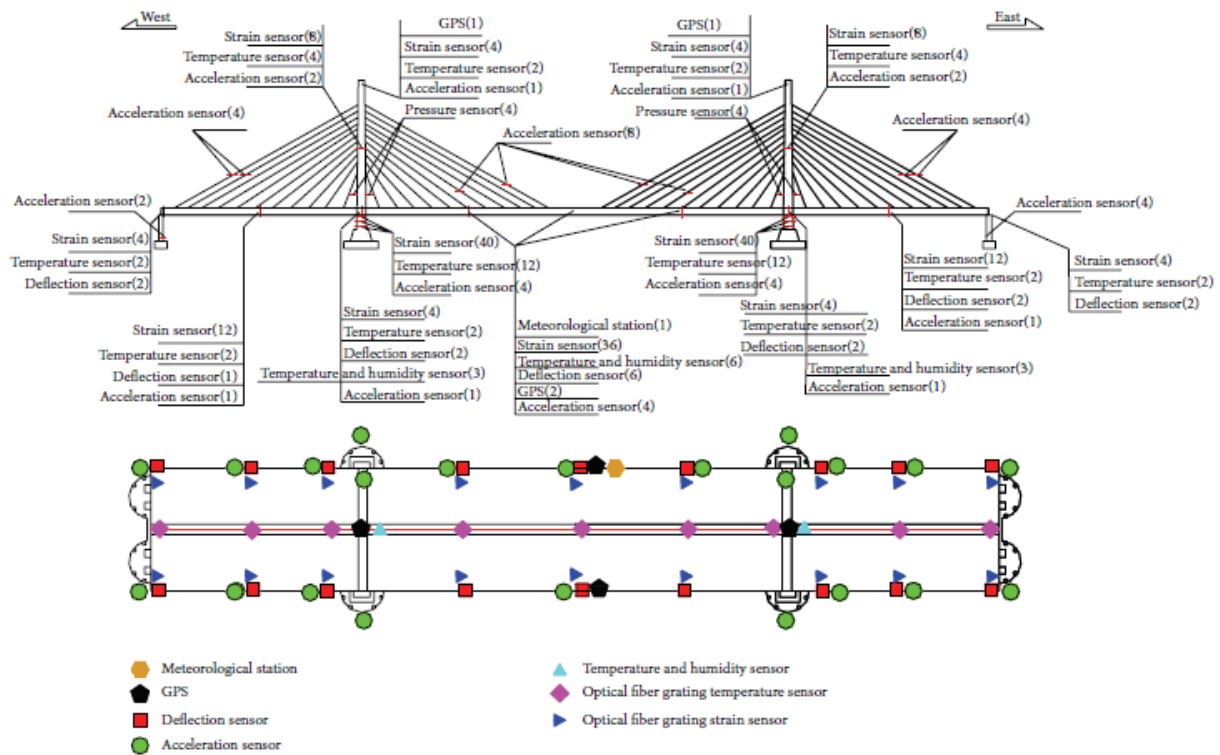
Layout of sensors on Zhijiang Bridge (Source: Chen, 2014)
